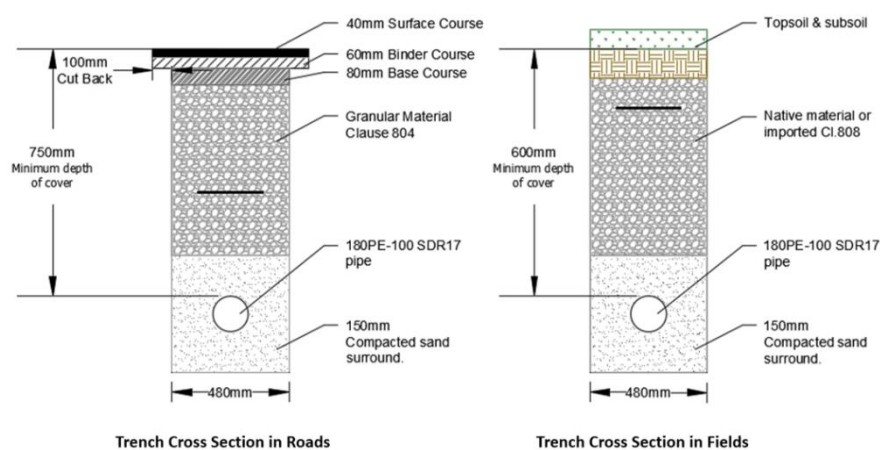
Typical GNI Trench Cross-Sections in Roads and Fields. Source: MDM Engineering
